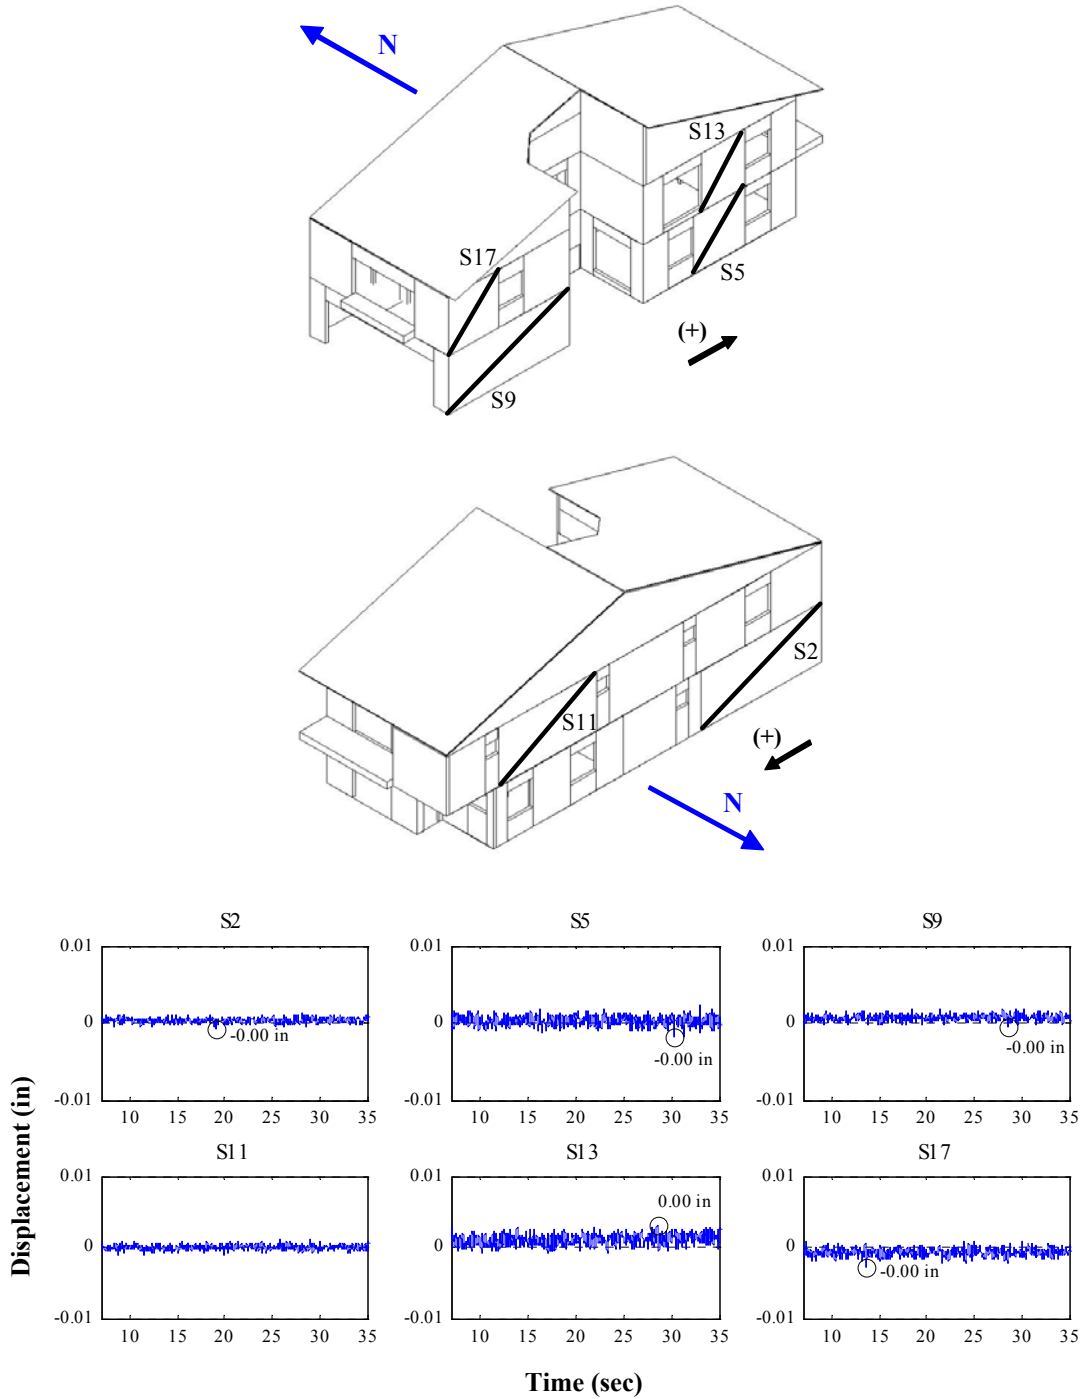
Wall deformations of east-west external walls for Test NWP1S02
